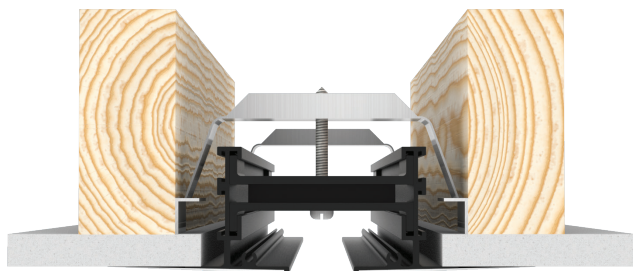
(Step 5A): Install Drywall – Exposed Face/Flange Border (A)
